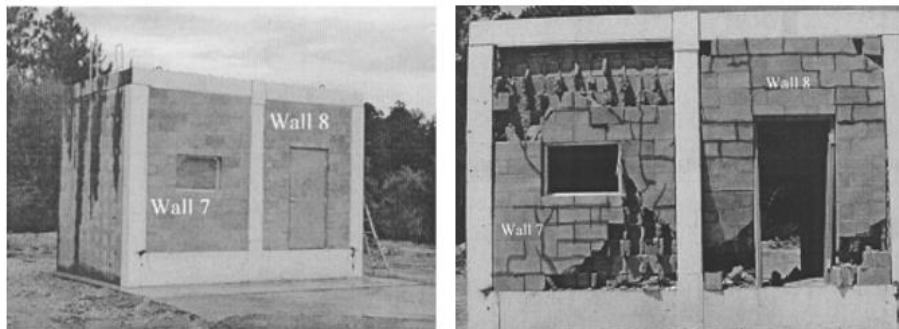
Walls tested with door and window openings. (Davidson et al., 2005)
